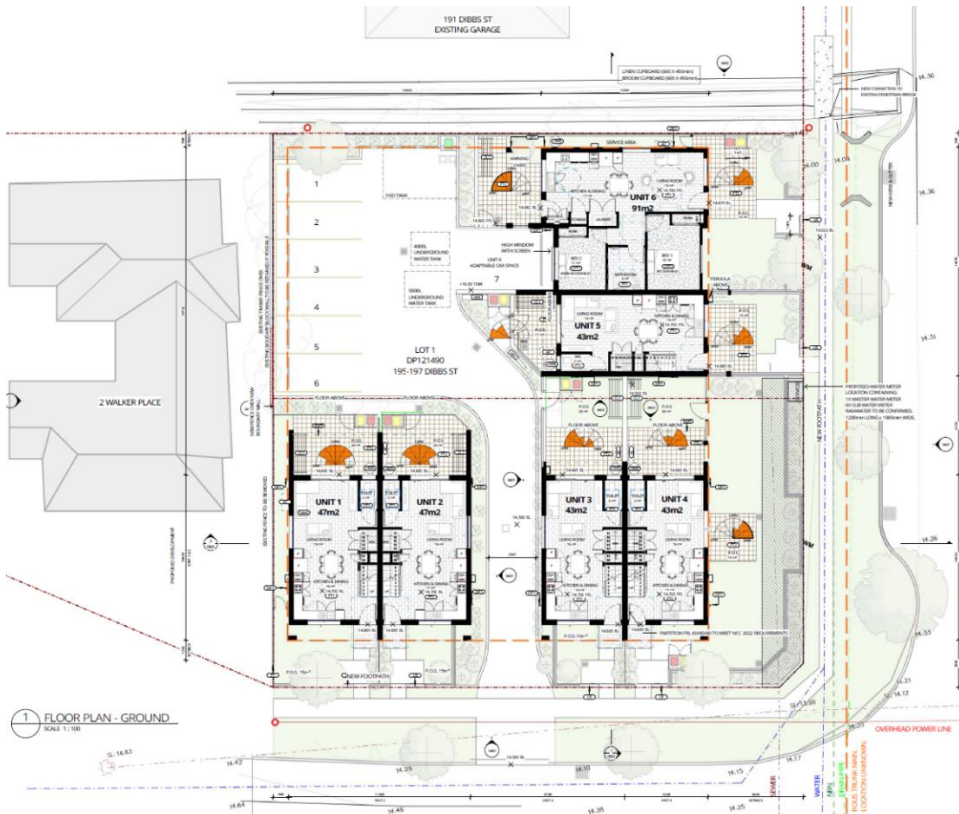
Extract from Architectural Plans – Ground Floor Plan (Source: Appendix A Architectural Plans prepared by Webber dated 20/11/2023)
